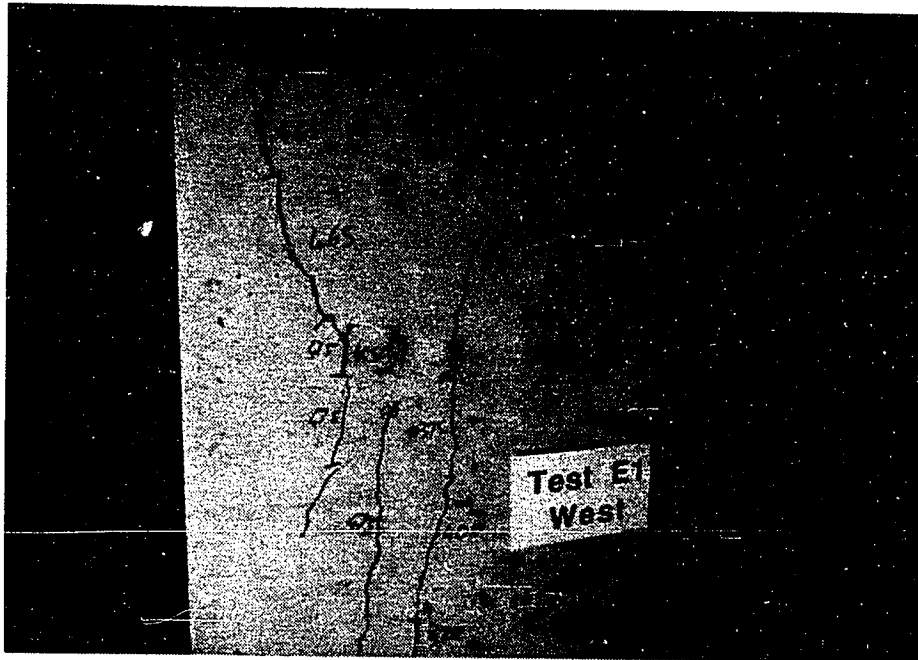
Spalling of Specimen E1 at Ultimate
